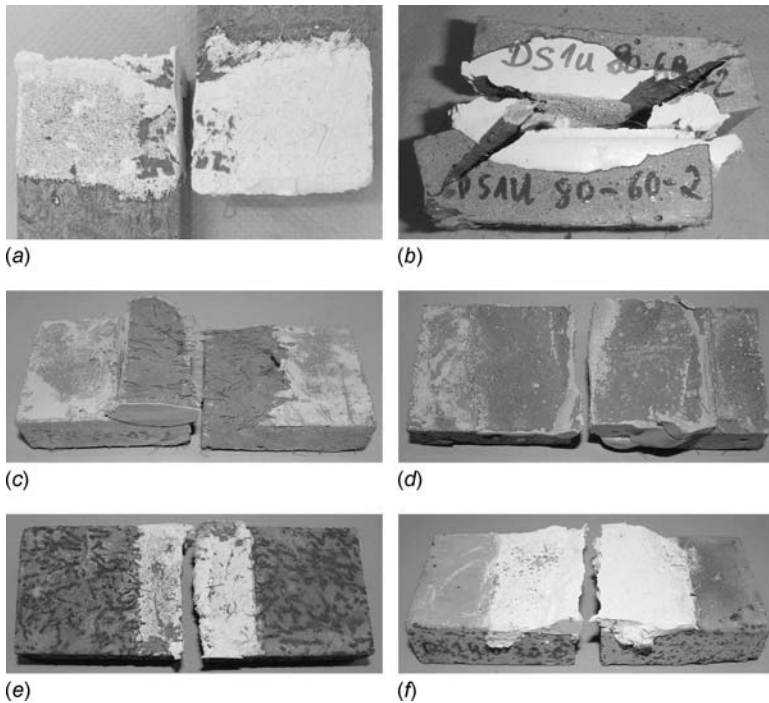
Surface fracture pattern and failure of UHPC specimens after compressive overlap shear testing. Specimens with no aging treatment: (a) Adhesive failure on the unmodified concrete; (b) forced diagonal crack through huge overlapped specimen; (c) failure deep in the concrete with ductile behavior; (d) failure in the concrete boundary layer. Specimens after 10-week VDA aging: (e) Sandblasted surface with mixed fracture pattern; (f) cohesive failure through mid overlap length.
